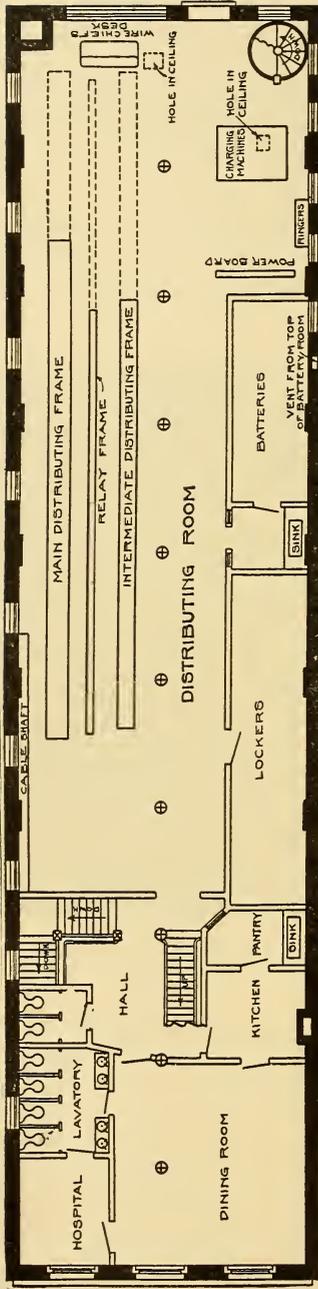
FLOOR PLAN TERMINAL AND POWER ROOM—LOS ANGELES OFFICE.
